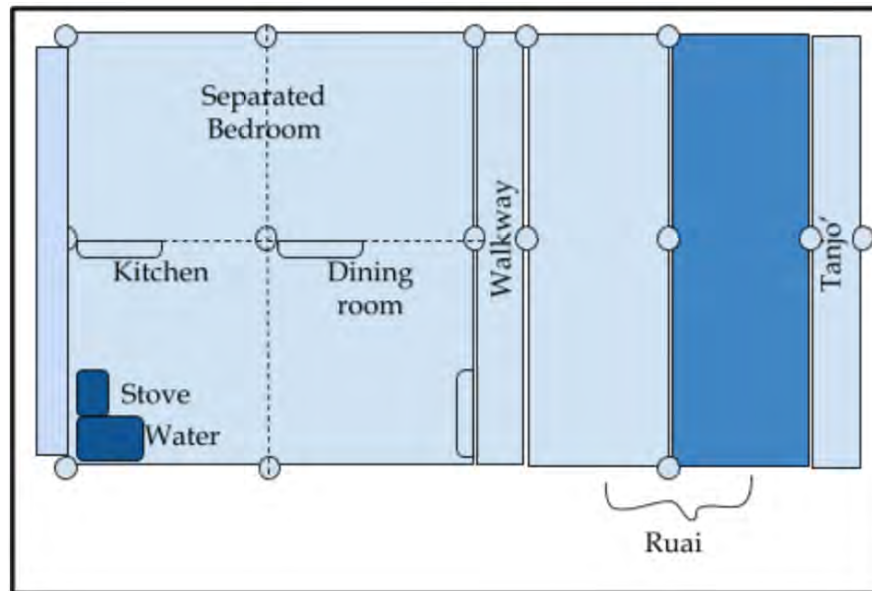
shows a floorplan of one bilik apartment of the second Rumah Panjang.
